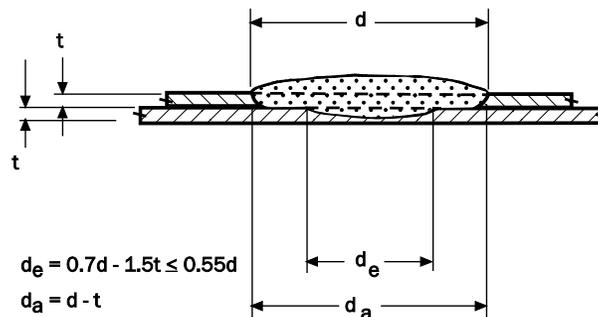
Arc Seam Weld – Sheet to Sheet
